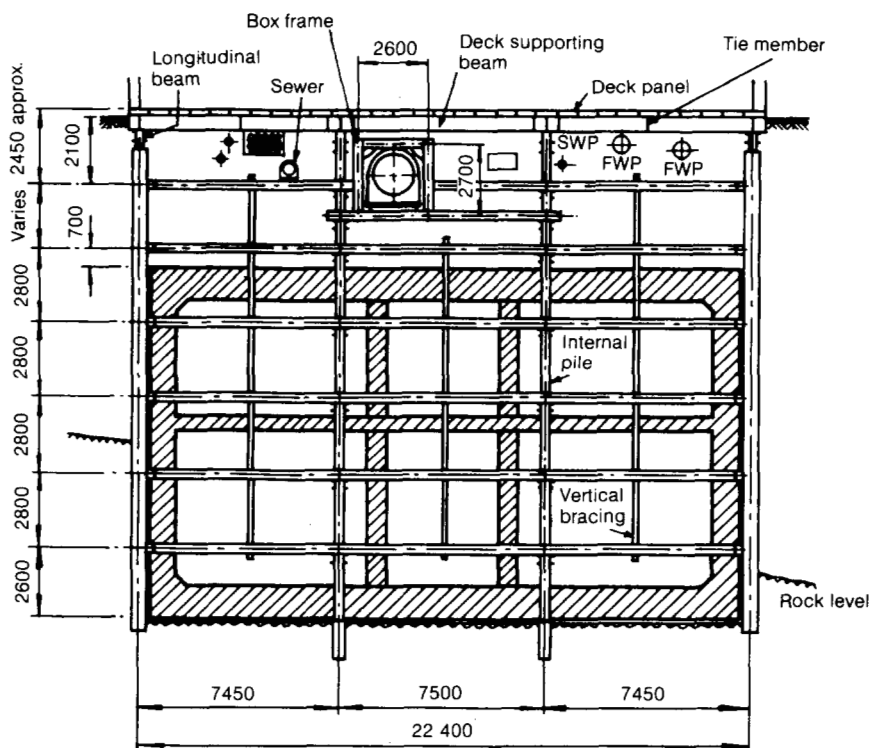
Tsim Sha Tsui station—typical cross-section, showing temporary deck support (dimensions in millimetres)
